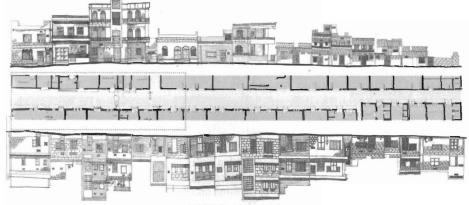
Plans and elevations of a street in the city center (image by A. Sheth, A. Zanirato, S. Perini, T. Timbolo
